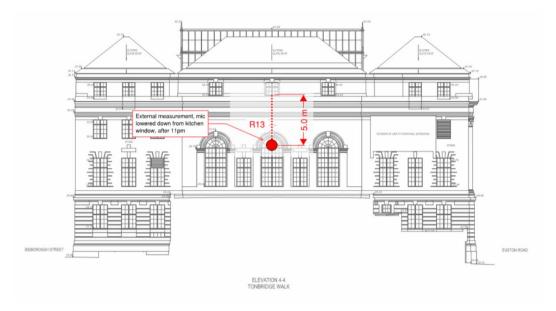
External measurement location, lowered down from the kitchen on Third Floor level of existing site
